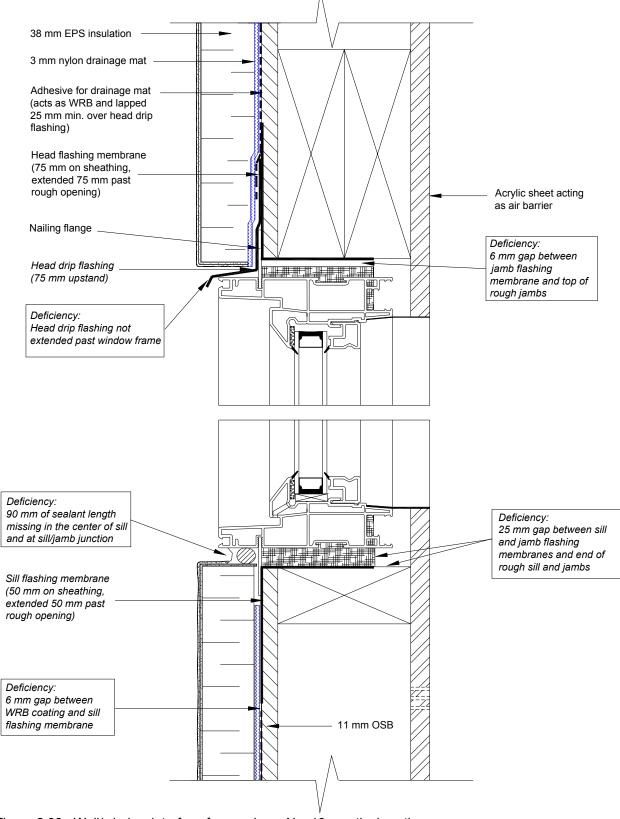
Wall/window interface for specimen No. 10 - vertical section
